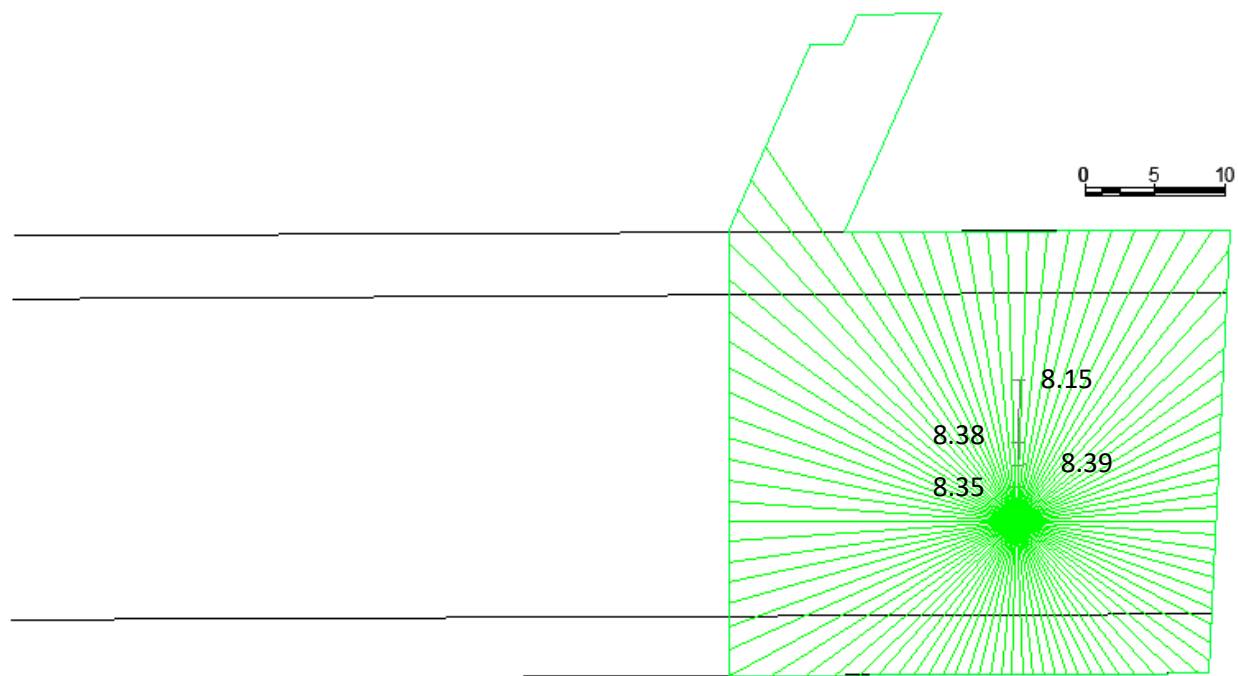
True long view of the 16N Stope hanging wall after Blast 17 showing the ERF calculation for anchor 6.
